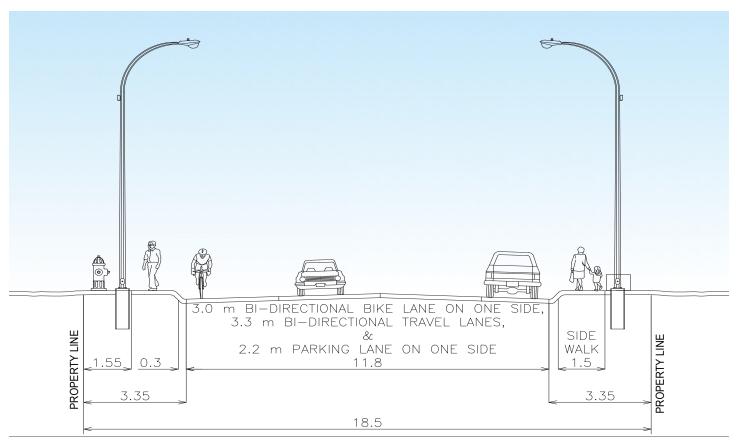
Conceptual Road Cross Section 18.5 m Local Street with Cycle Lane
